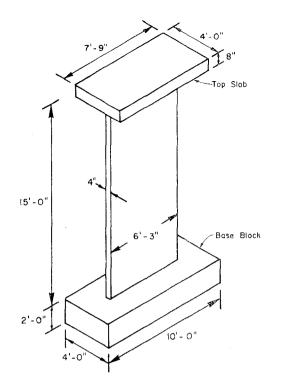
Nominal Dimensions of Test Specimen With Rectangular Cross Section (1 in. = 25.4mm)
